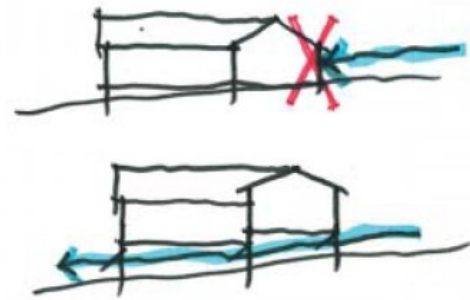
Graphic illustrating elevation of structure with soft story breakouts.
